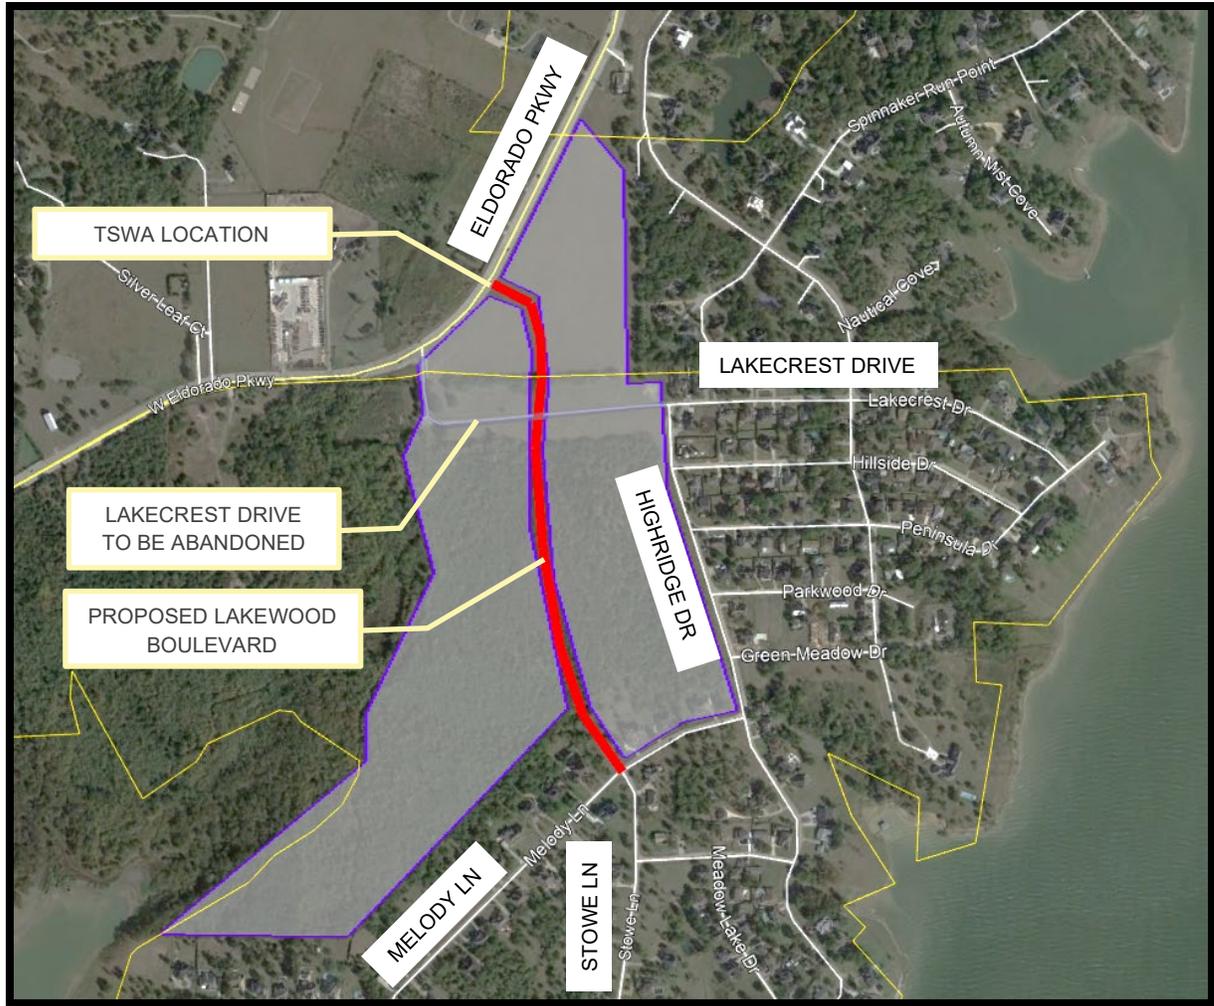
Planned Roadway Improvements, Land Development, and TSWA Location
